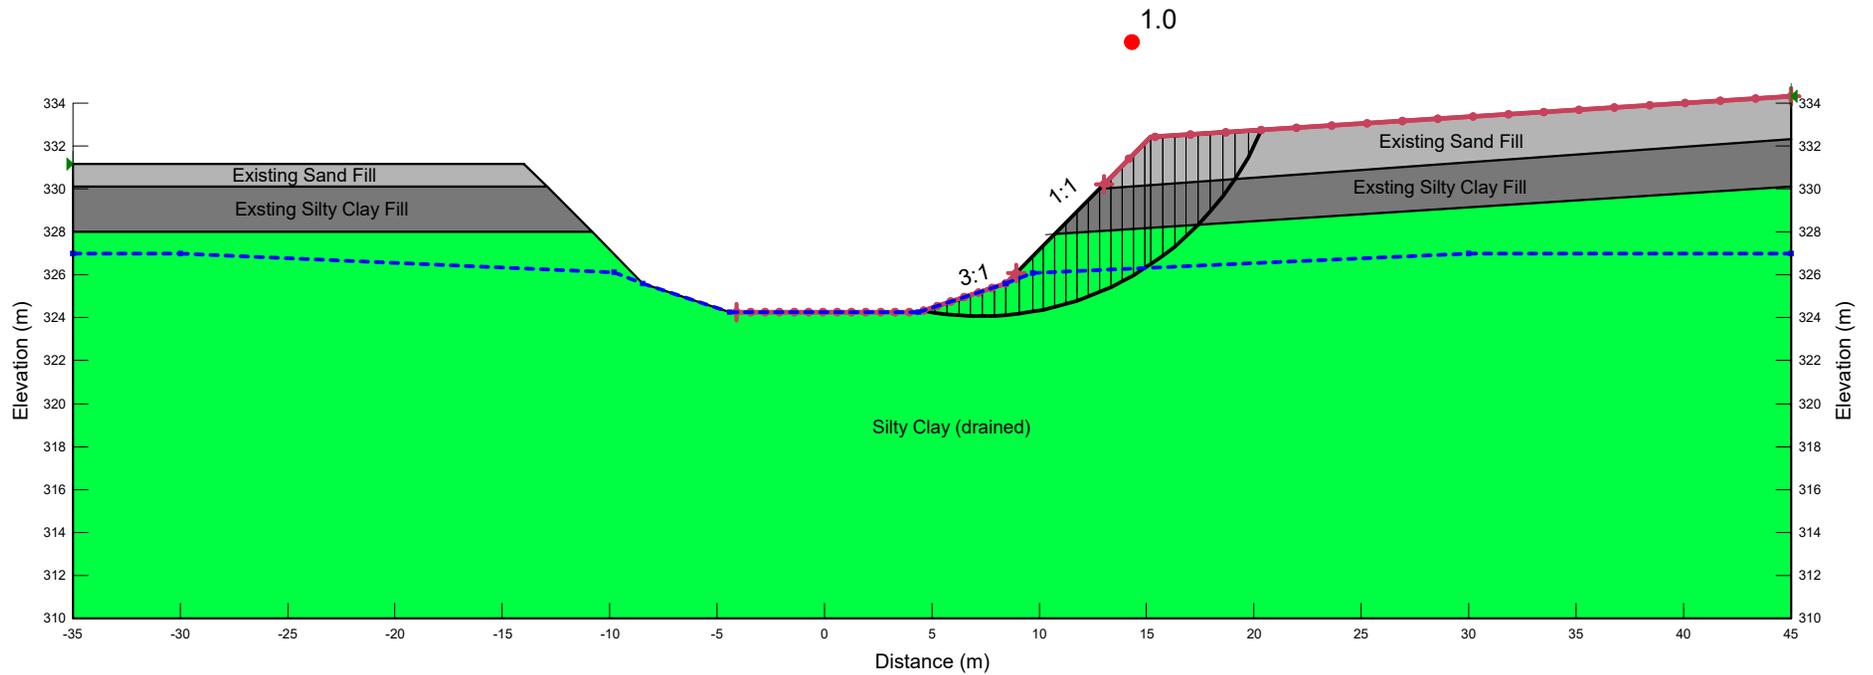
Lyon Creek Culvert Replacement - Temporary Excavation - Side Slopes 1:1 [Drained Analysis]
